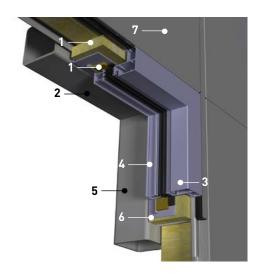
Window frame in the joint, flush with the surface of Qbiss One F façade elements
